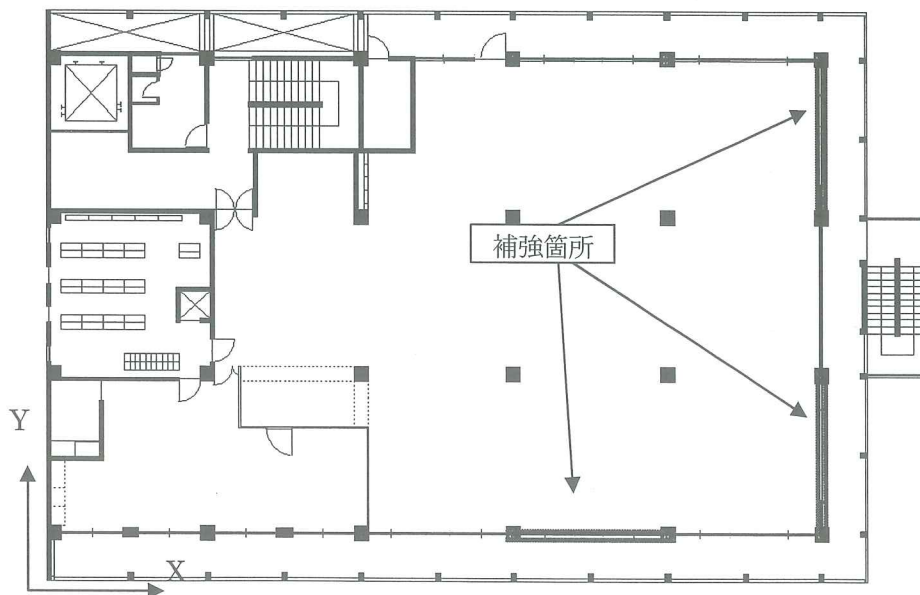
Second floor plan of library drawing reinforced with RC-walls
